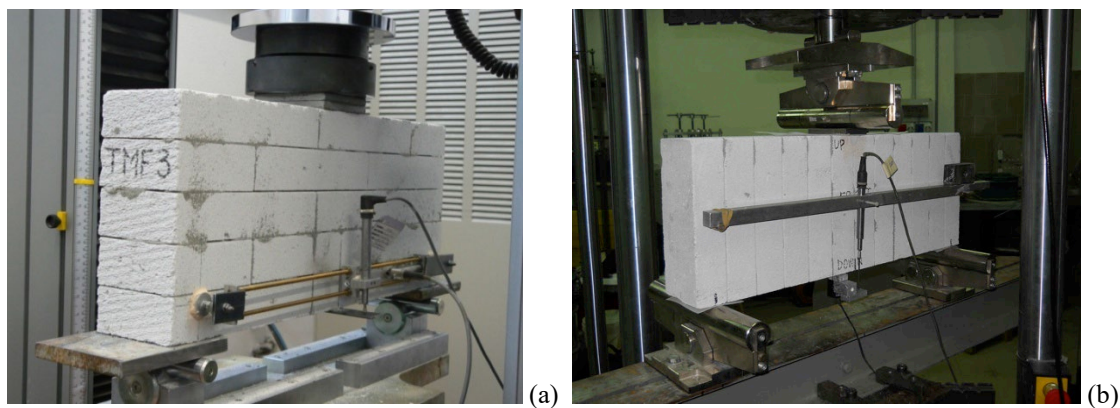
Three-point bending tests on AAC masonry beams BMF (a) without and (b) with notch: adopted setup.
